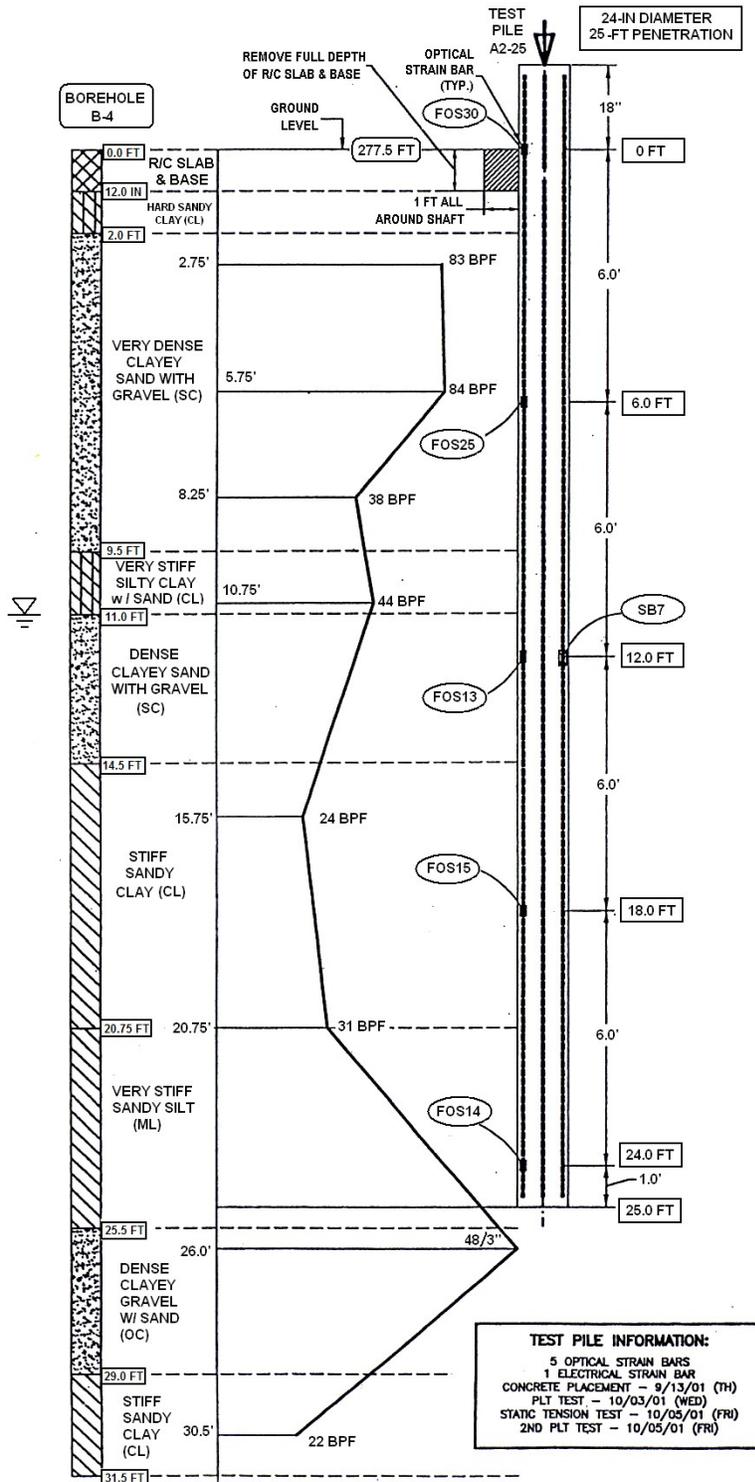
Schematic Soil Profile of Test Area 2 and Test Pier
